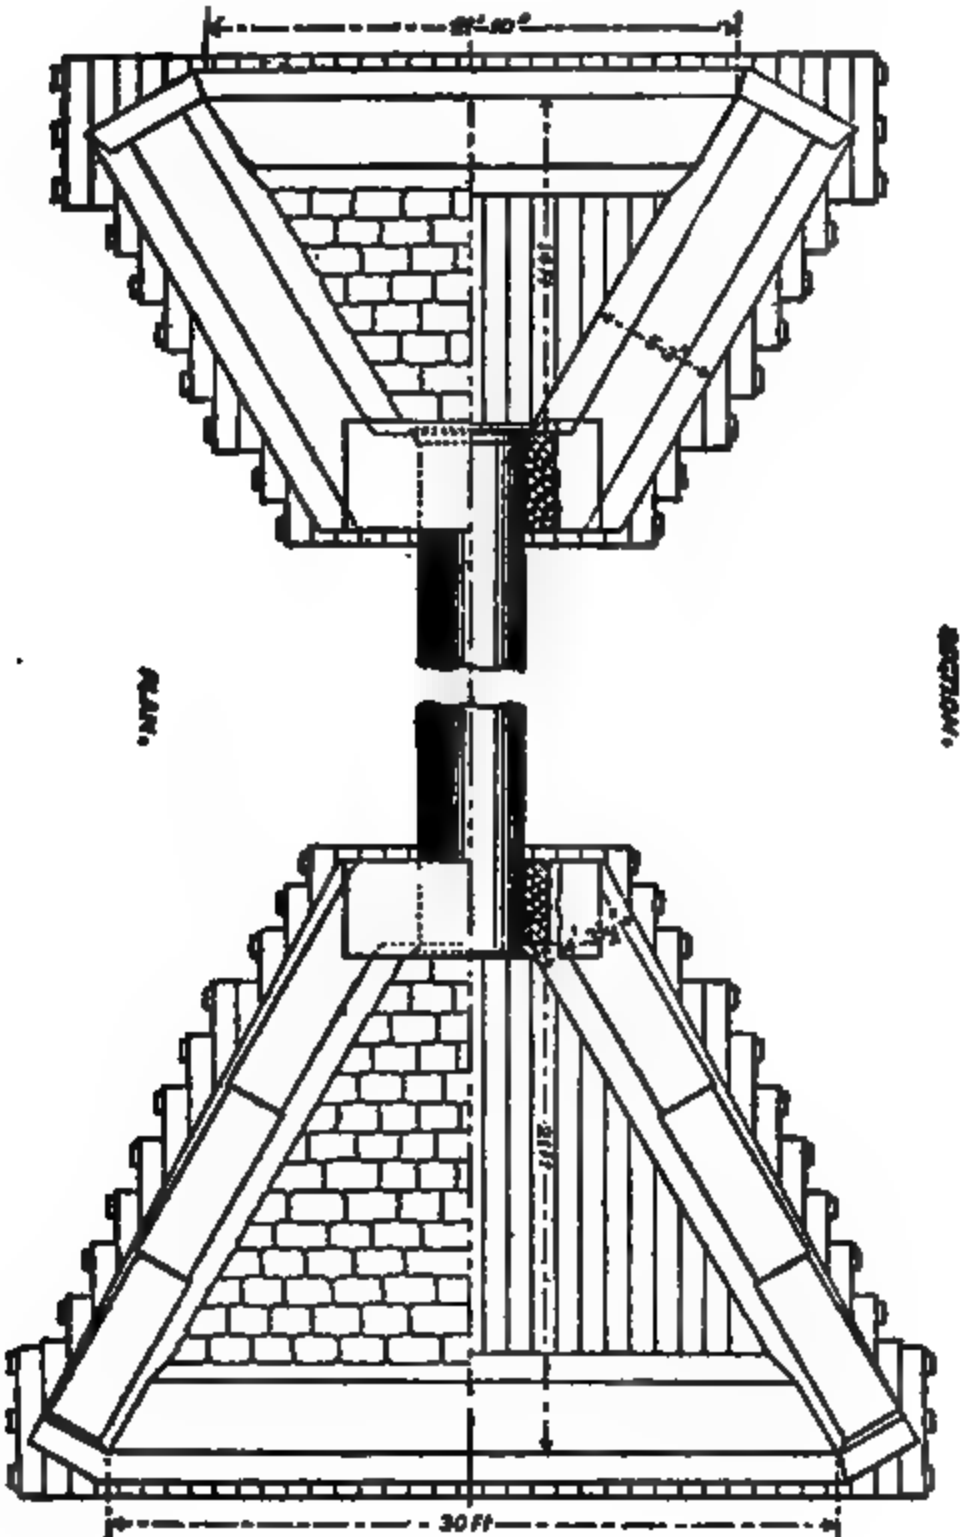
CAST-IRON PIPE CULVERT.—C., B. & Q. R. R.
